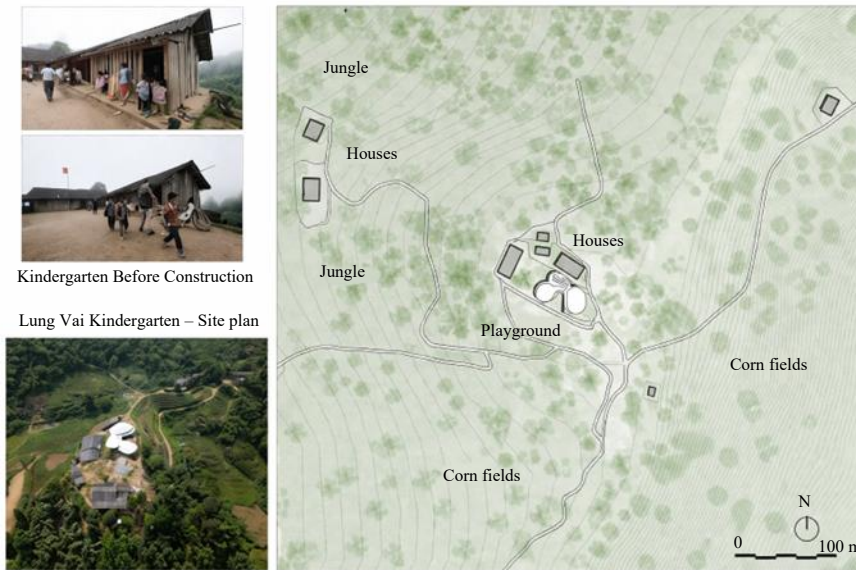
Pre-construction timber classrooms and site plan illustrating terrain and settlement pattern.
